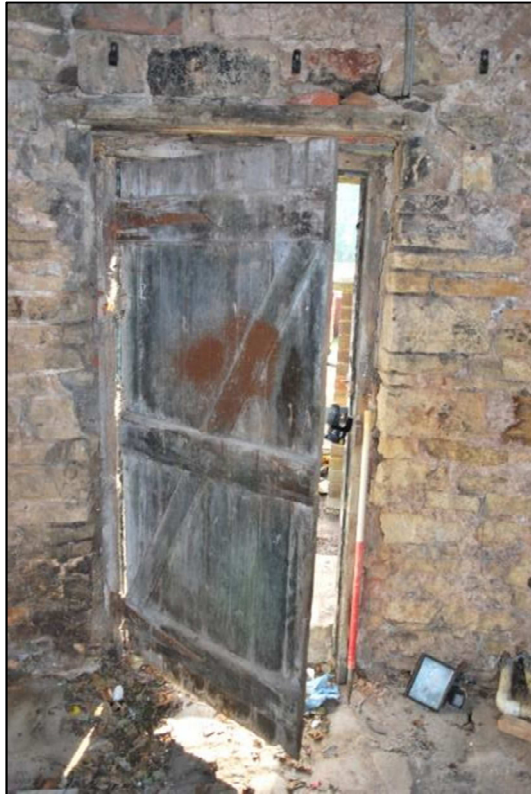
(Shot 81): Ground floor entrance, looking southeast (1m scale)
